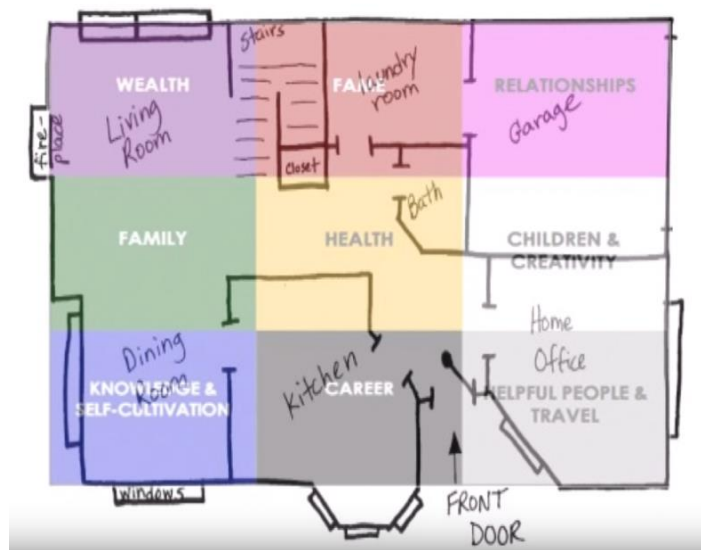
Superimpose Bagua onto the floor plan
